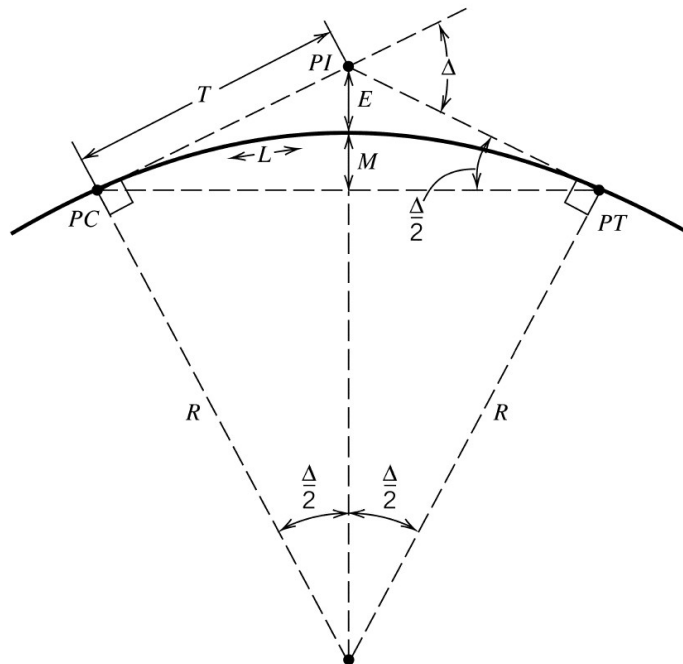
Typical Horizontal Alignment at Road Centerline (Mannering and Washburn 2013, 81)
